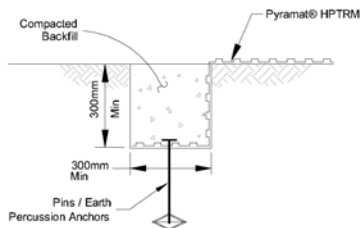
LONGITUDINAL EDGE TRENCH DETAIL
